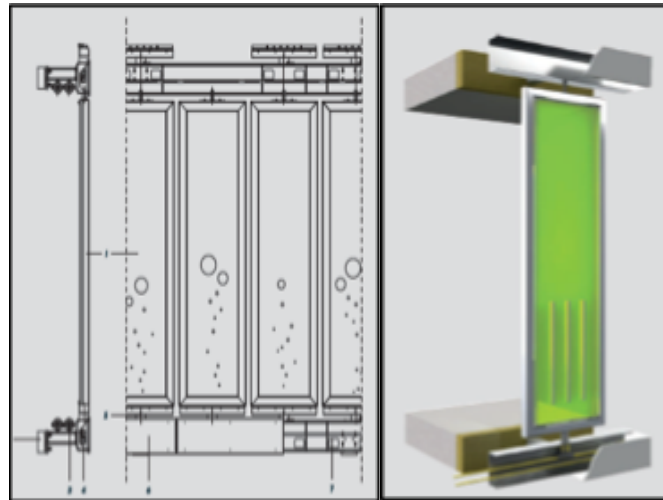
BIQ House Hamburg Elevation, BIQ plant room, PBR diagrammatic view.
